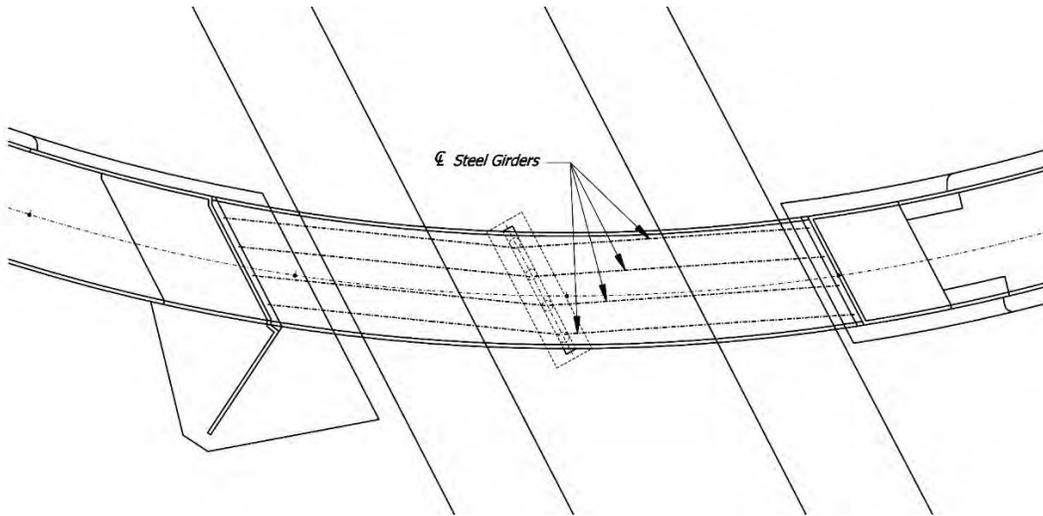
Plan view of a curved bridge with piecewise straight girders.
